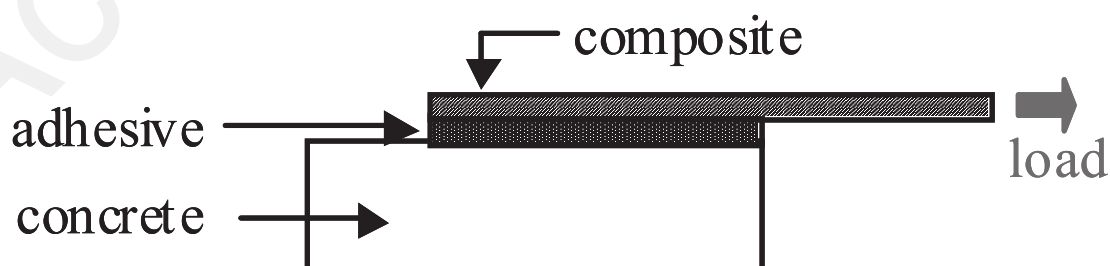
CFRP strengthened concrete specimen. Shear load testing configuration
